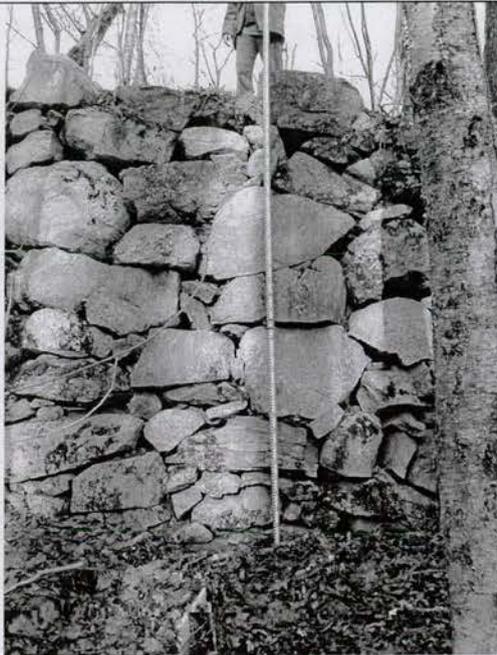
11-12-1-2005 London Bridge E wall, North to South, Section 7B View W
